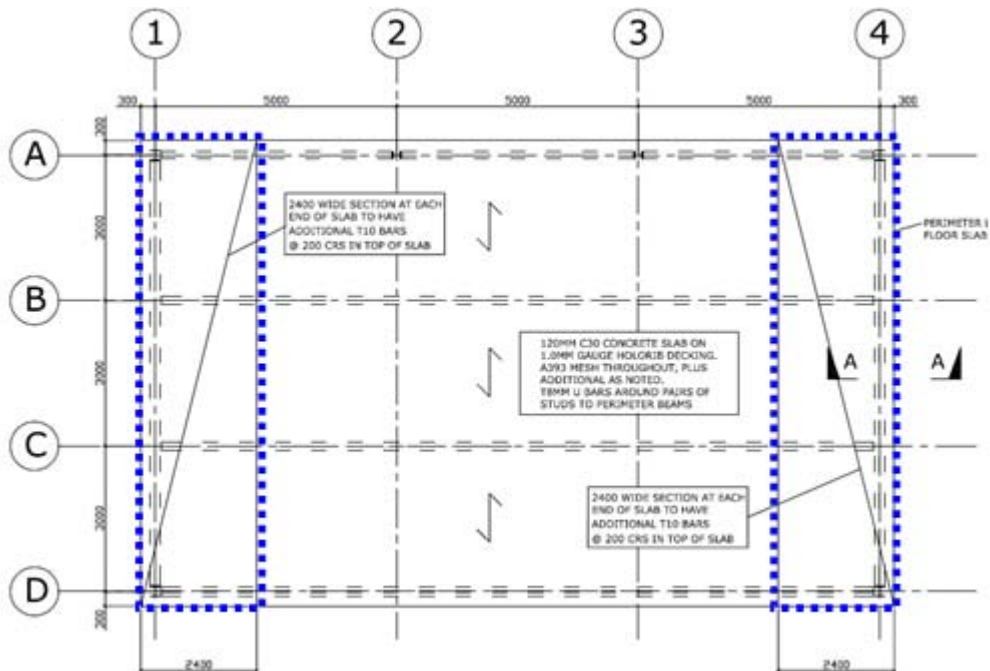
Reinforcement mesh of the slab: view on top of slab
